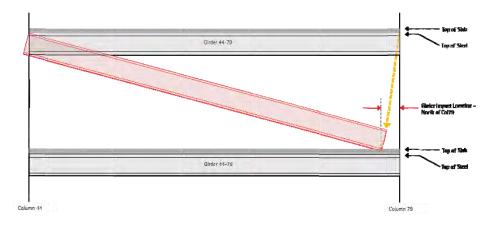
Girder 44-79 Simplified Rotation Diagram
